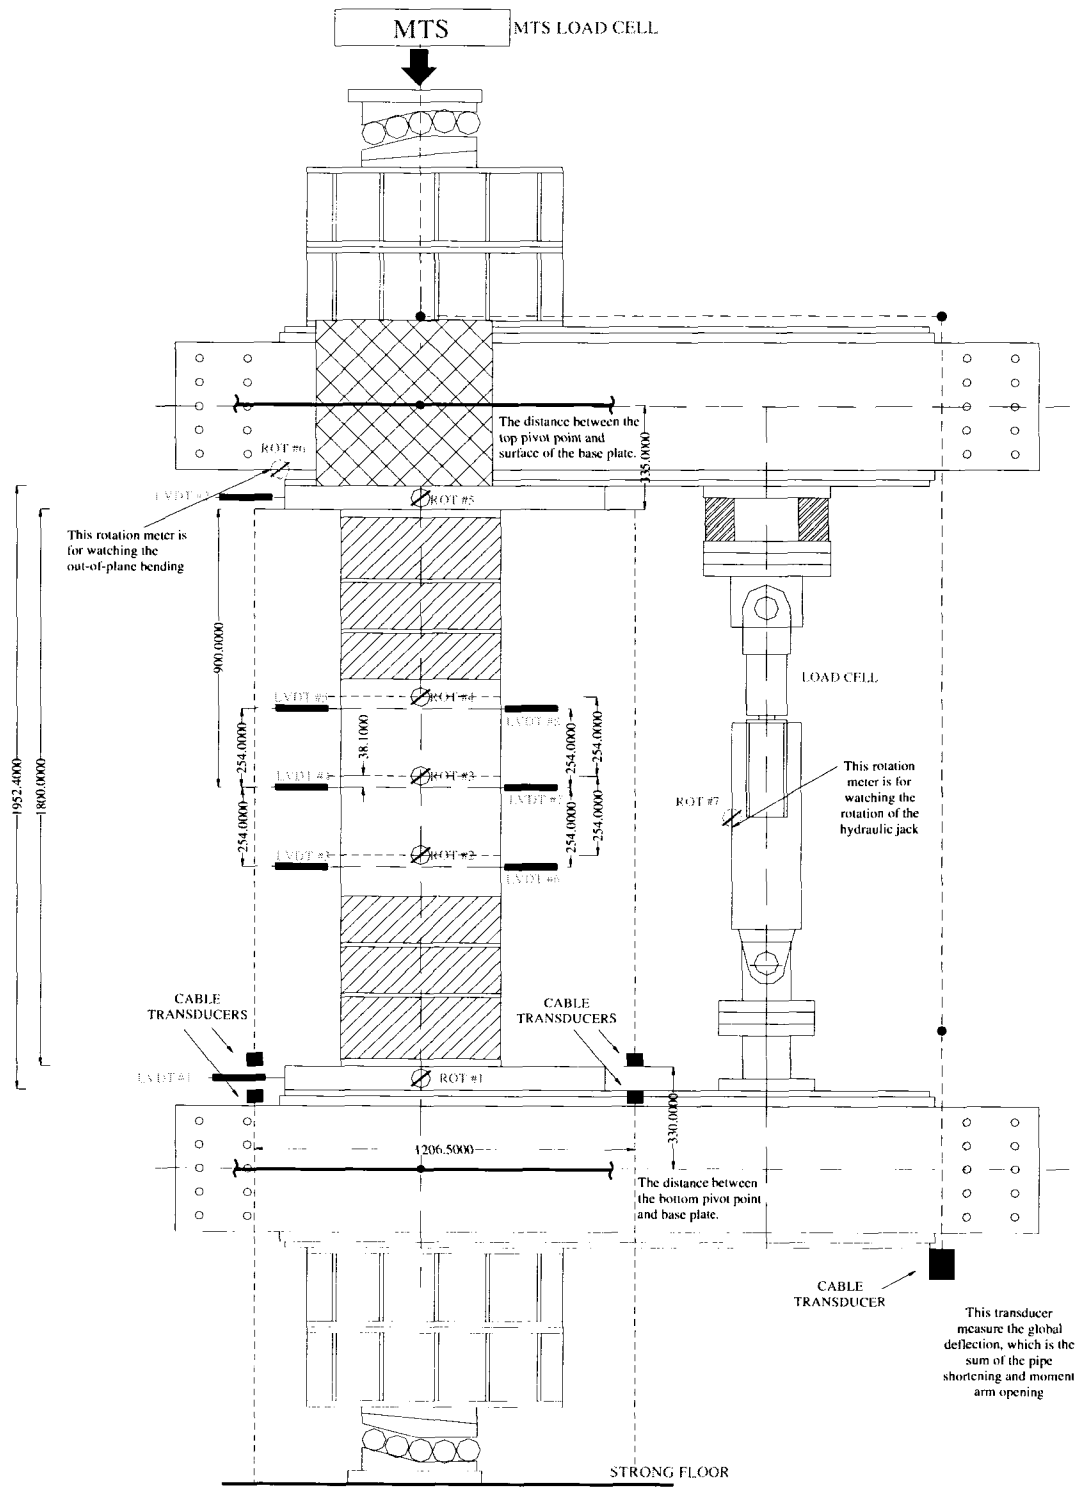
LVDT-RVDT-Cable Transducer Layout for 20 inch Pipes
